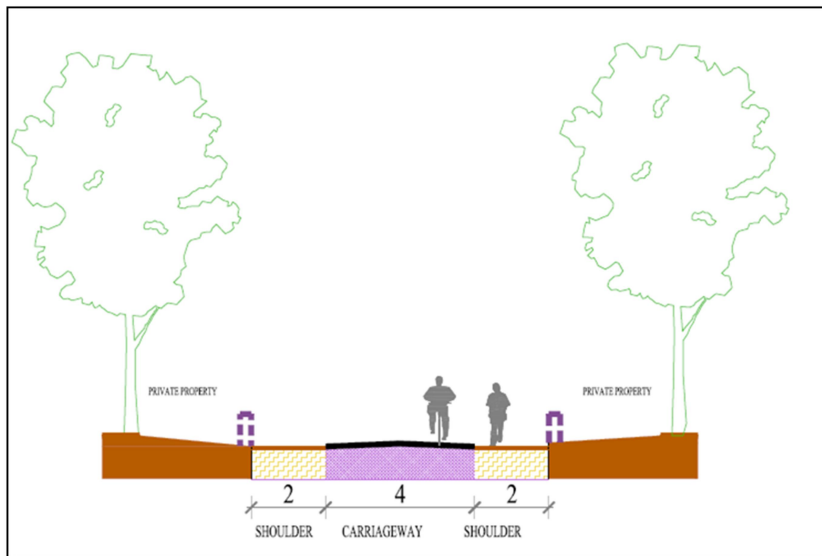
Road section for ROW 8 m connecting Labudih
